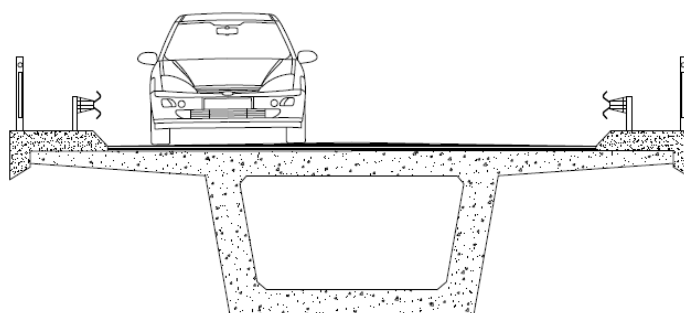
Example of a hollow (box) cross-section for the girder of a bridge deck.
